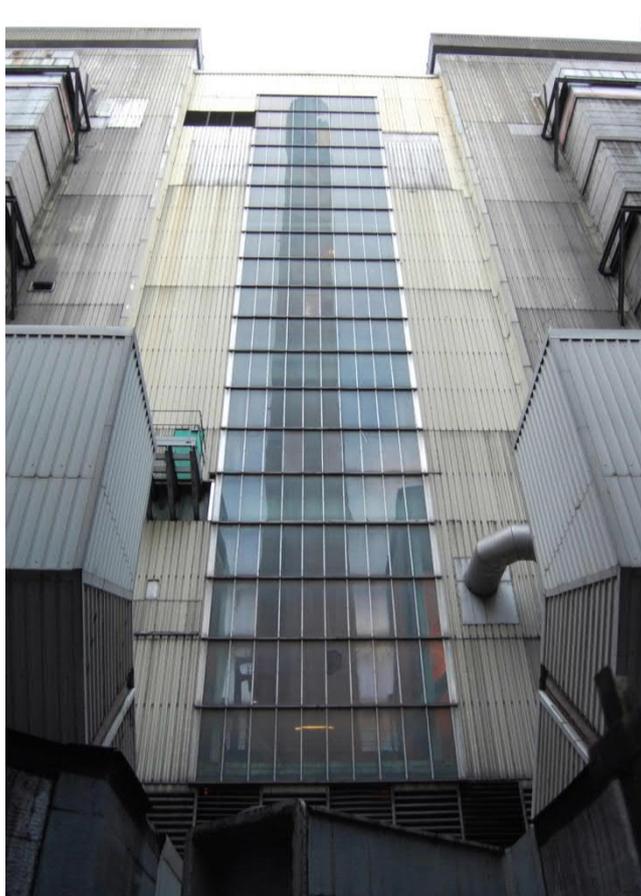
Detail of the glazing on the south-east elevation of the boiler house.
